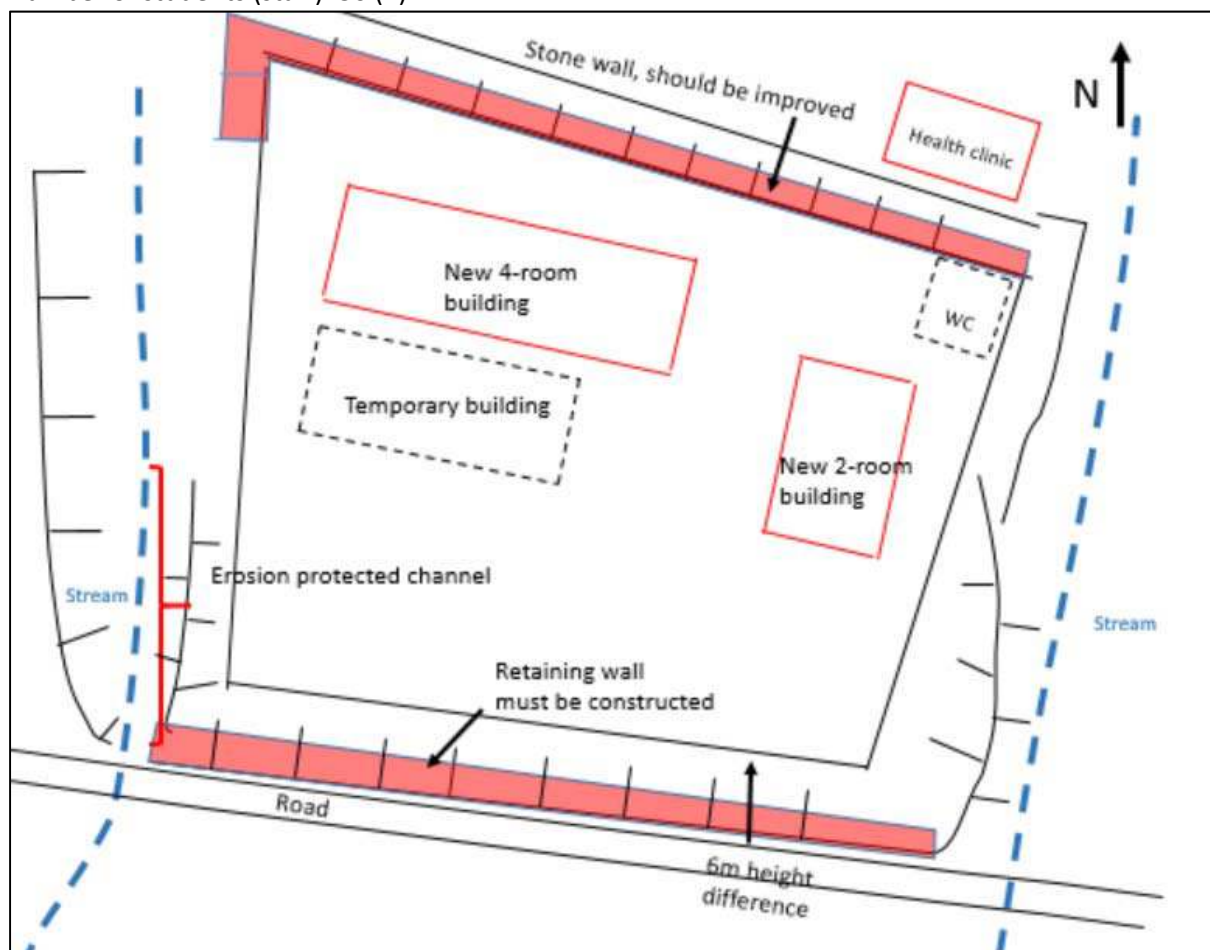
Plan view – Deadhunga. A retaining wall south of the plot should be constructed. The western stream should be secured by building an erosion-protected channel to avoid water into the school plot during critical rainfall. The masonry wall north of the site should be improved slightly.
